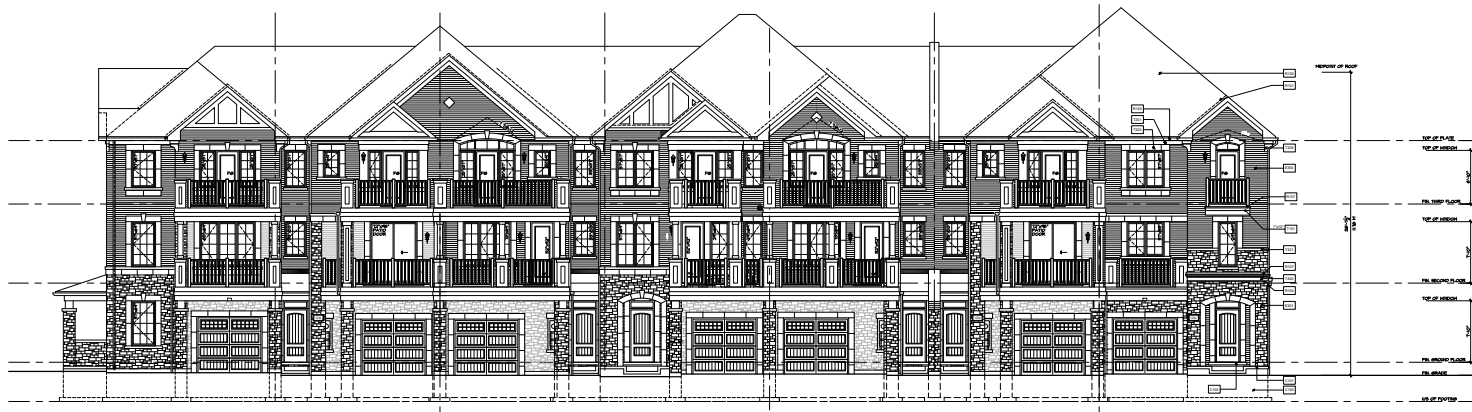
Back-to-back Townhouse Front Elevation Example 2
